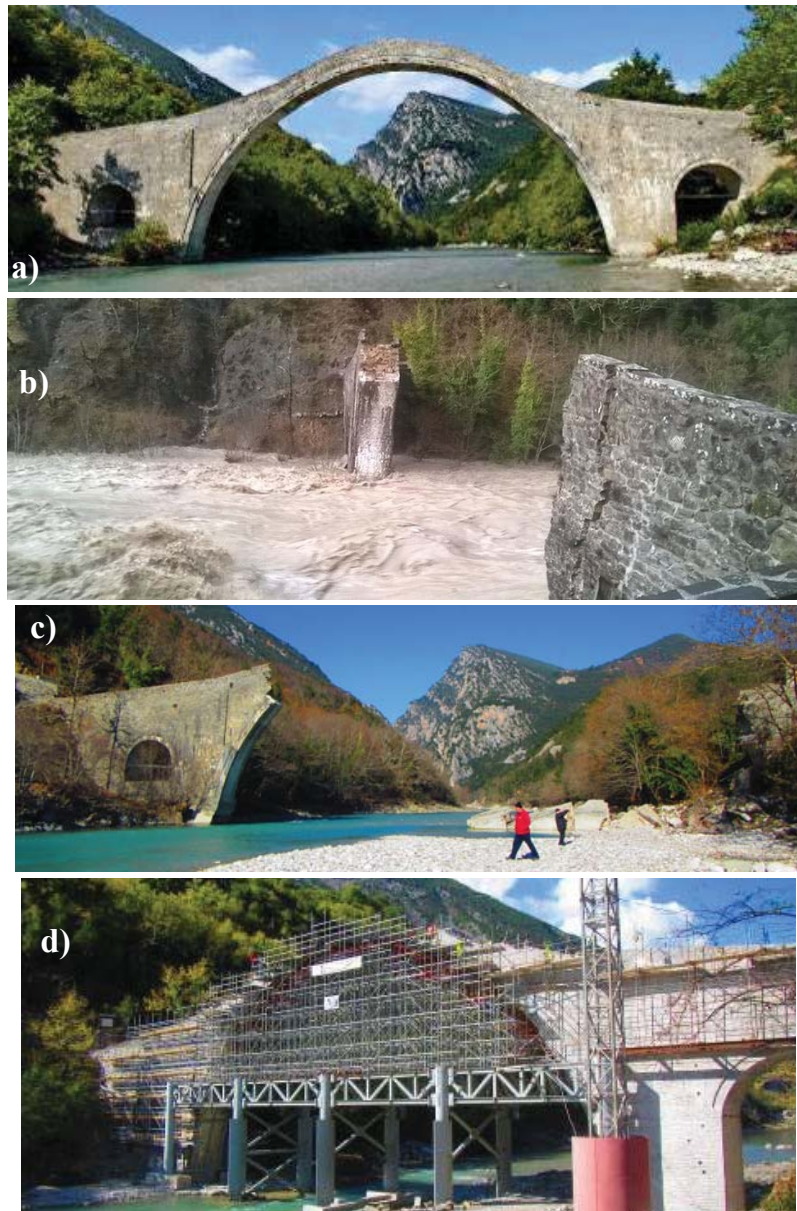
Collapse from flooding and reconstruction of the Plaka stone masonry bridge
